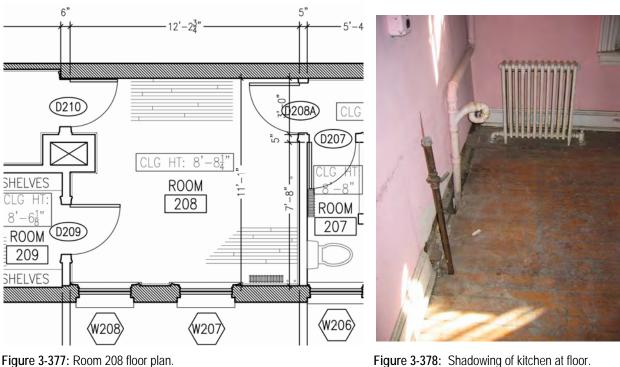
Shadowing of kitchen at floor. (Photo: BBB, 2007)
